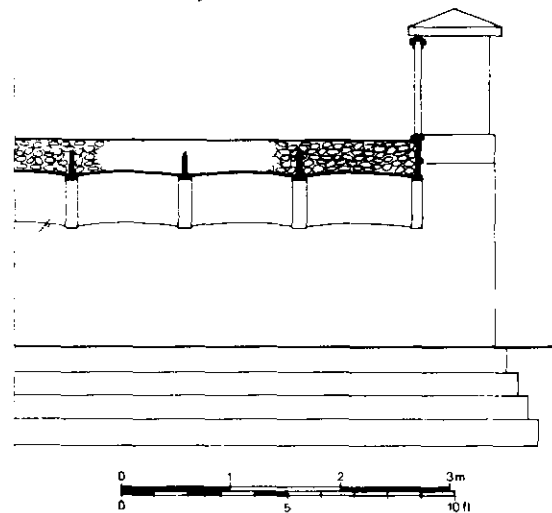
HALF SECTION THROUGH DECK (after Carver)
